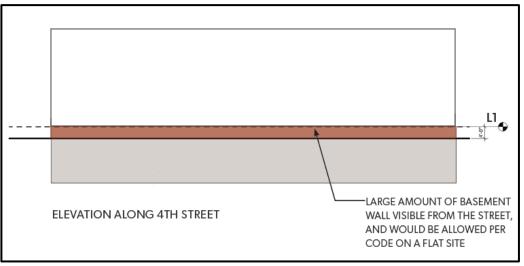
Parking Garage Ceiling Plane (Project Plans Page 46)
